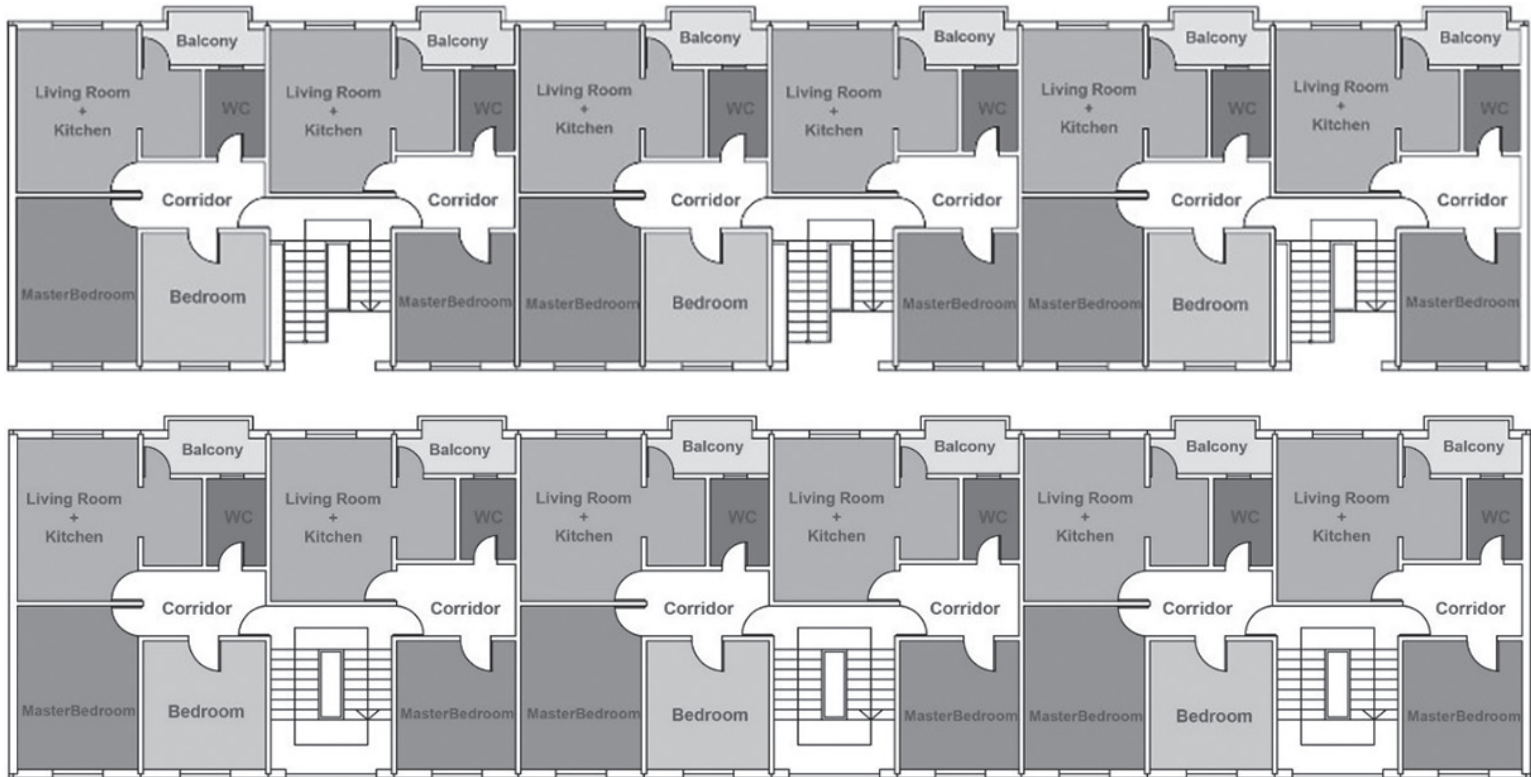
Building layout plans with associated functional spaces for [PRT] and [PRP] (ground and typical floor).
